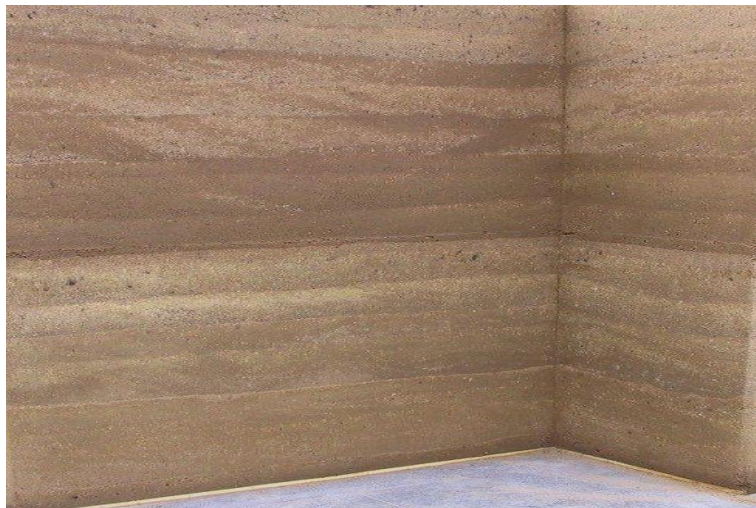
Two walls made out of rammed earth (Design Build Live, 2010).
